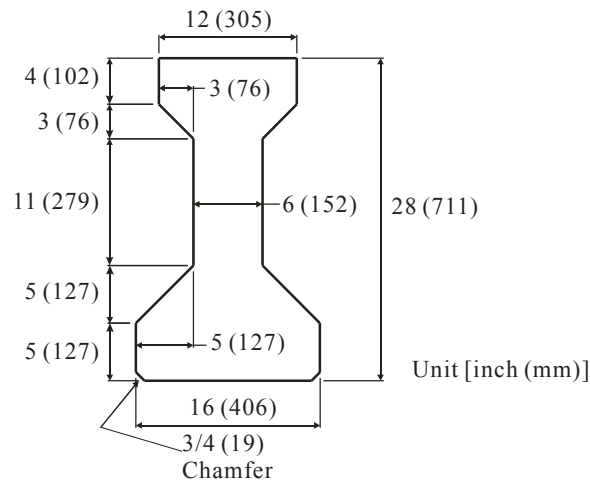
Dimension of Cross-Section of Type A Girder.
